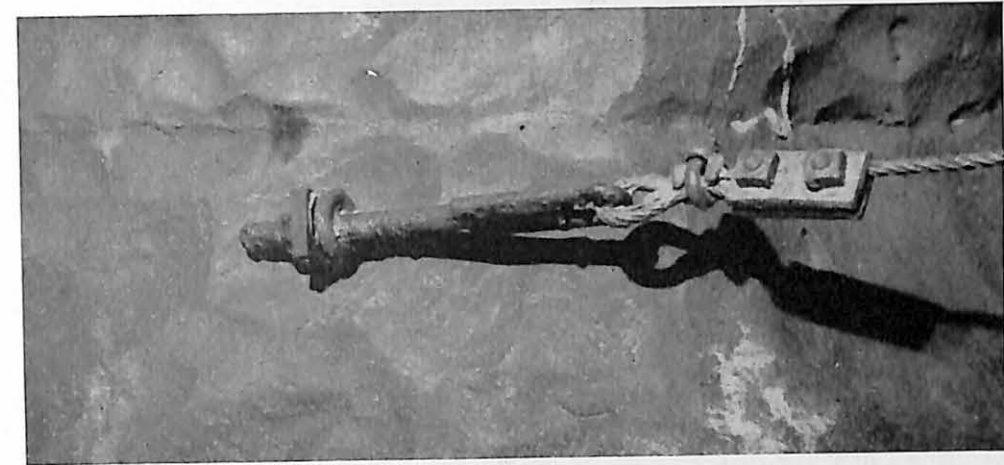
PLATE I. — Wire tensioning bolt anchored to Rawlbolt.
